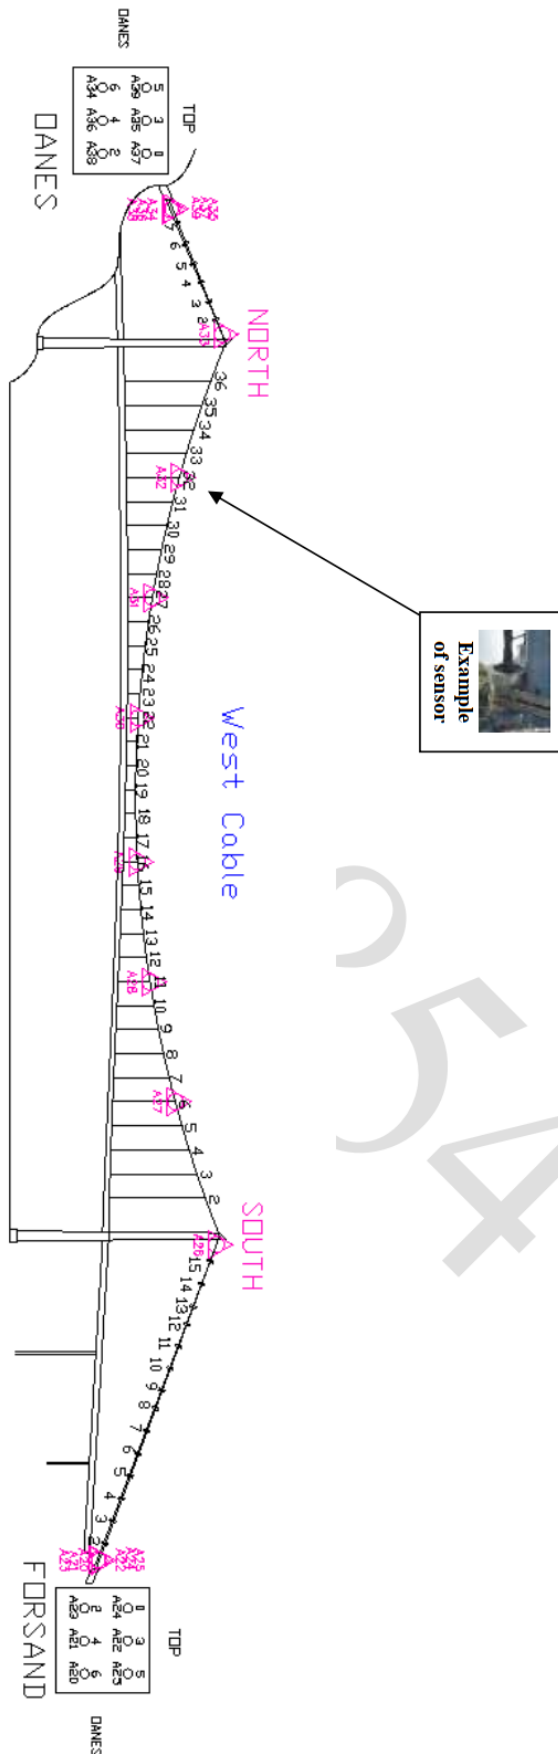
Location of installed sensors A20 to A39 on West Side [4]
